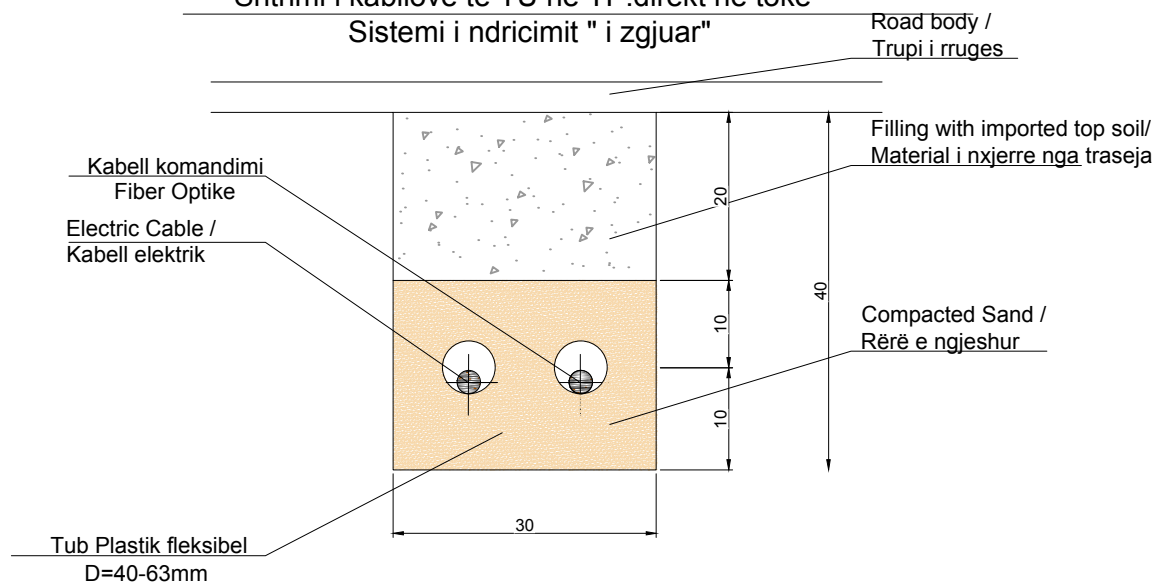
# DETAILS OF PATH LIGHTING/ DETAJE TË NDRIÇIMIT TE RRUGICAVE
